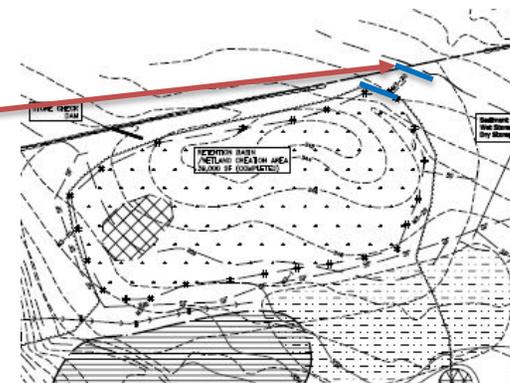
Stone check dam downgradient from created wetlands outlet is no longer functioning as intended and should be replaced.
